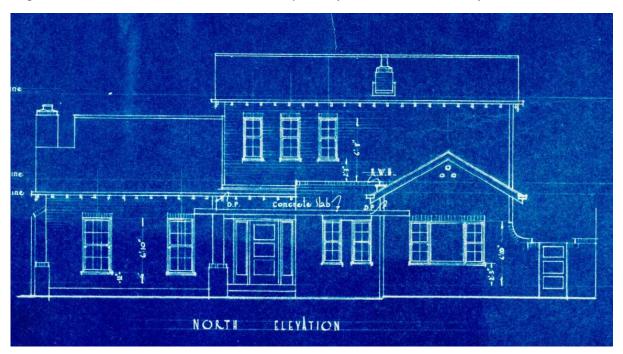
North side elevation as depicted in the 1940 building permit plans. Note the use of a concrete slab over the front porch. (Source: BP No. 12784, 1940)
